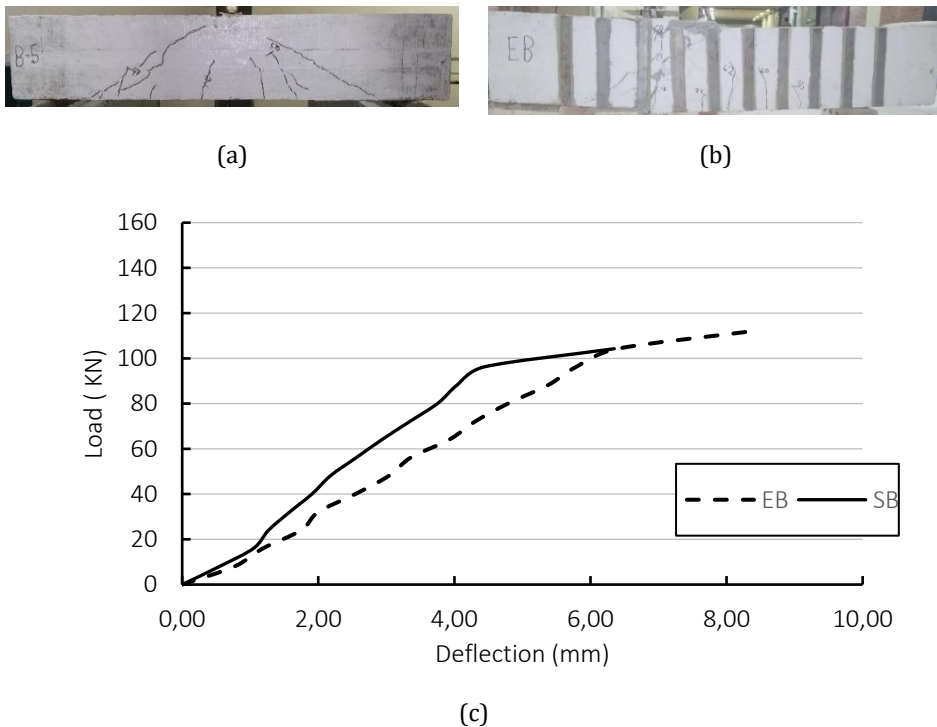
(a) Damaged beam for EB, (b) Failure Mode of beam EB, (c) Deflections of beams EB and SB
